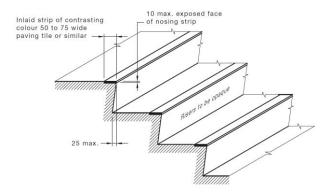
Nosing Details - Section 10.8.1 of AS1428.1-2009
